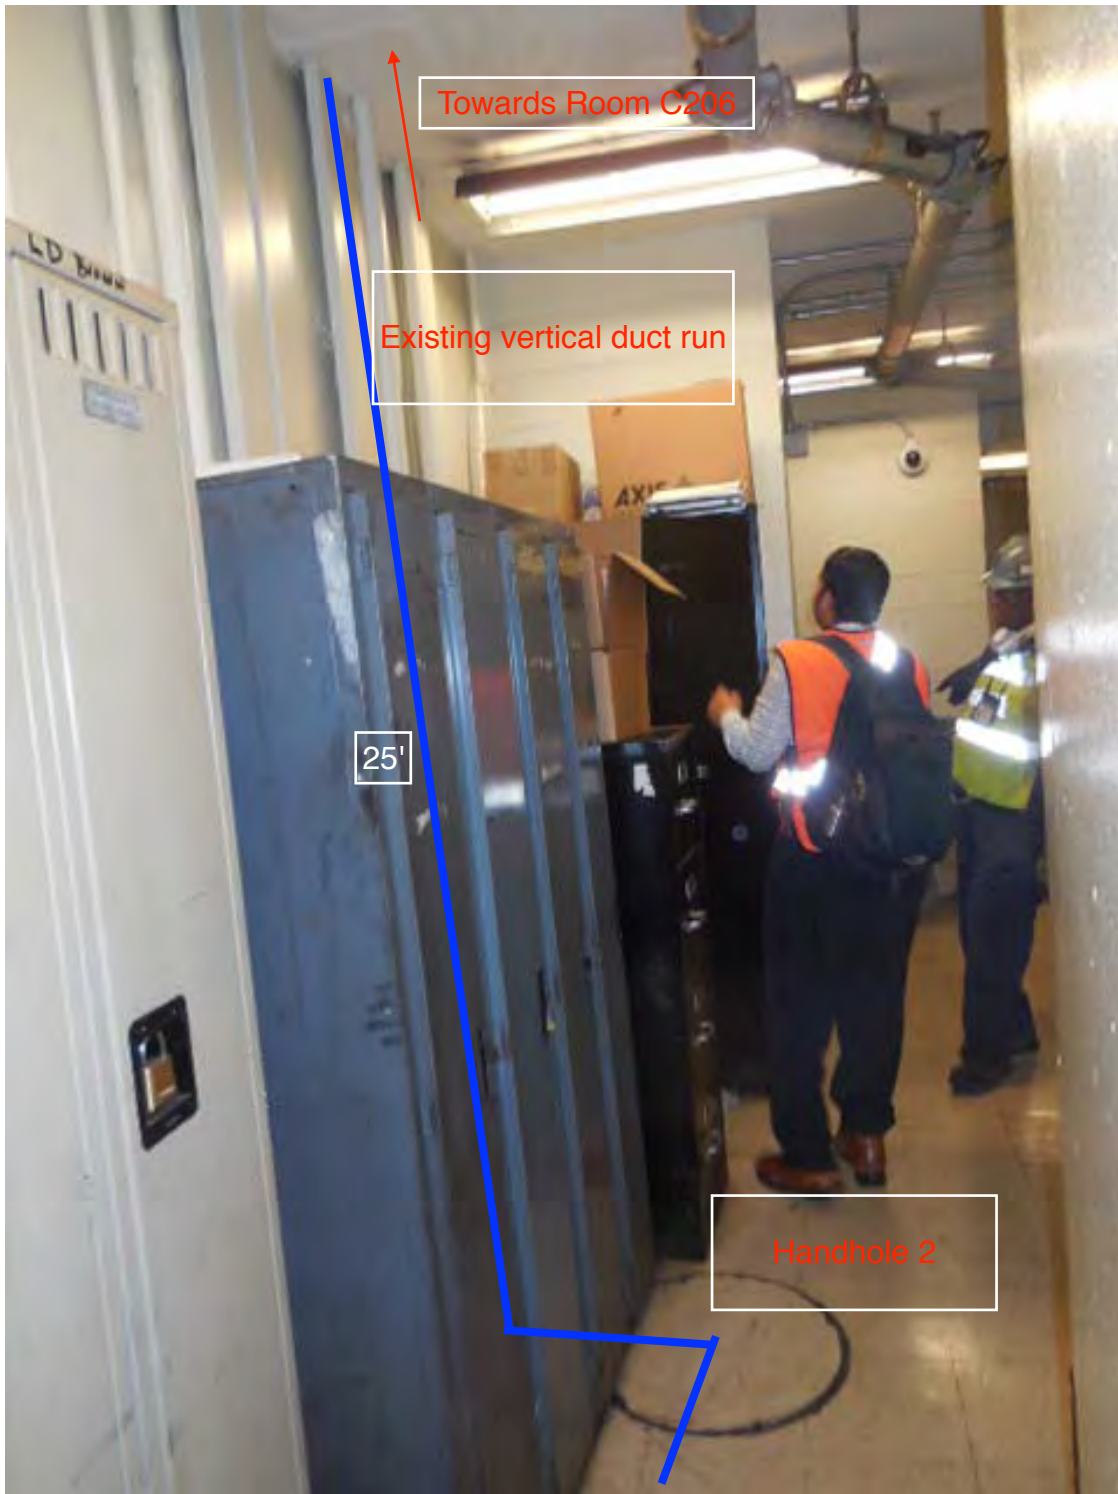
Proposed junction box and overhead conduit from duct stub-up in Cleaners Room.
